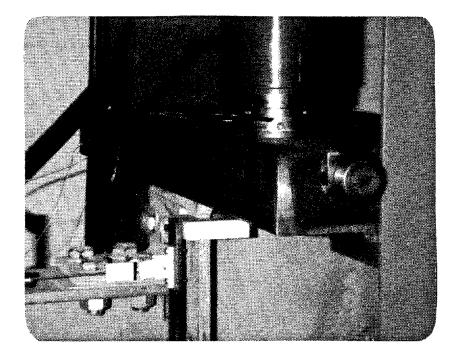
BEAM SUPPORTS FOR TEST SPECIMENS
